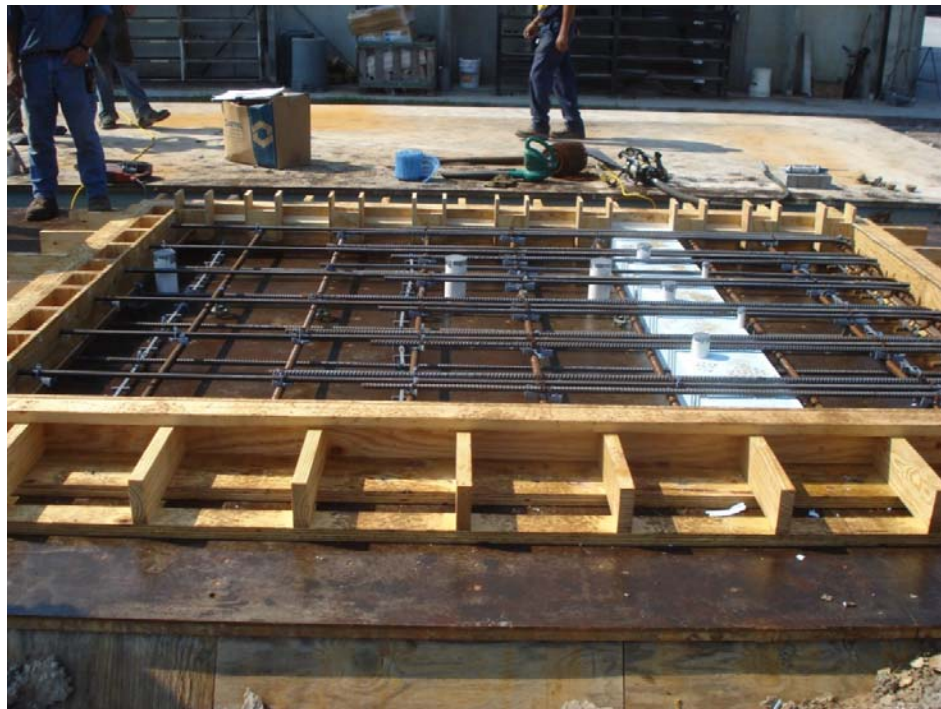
Typical Panel Formwork Looking Parallel to Girder Line
